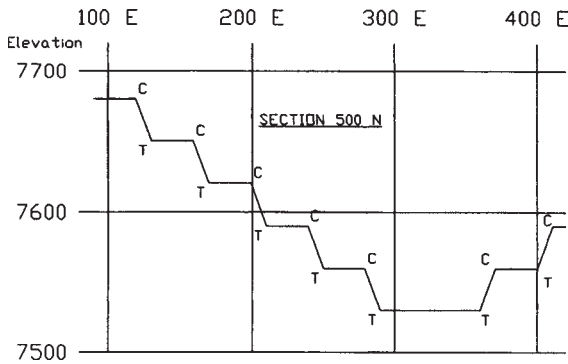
Cross-section through a portion of an open pit with toes and crests labelled.
